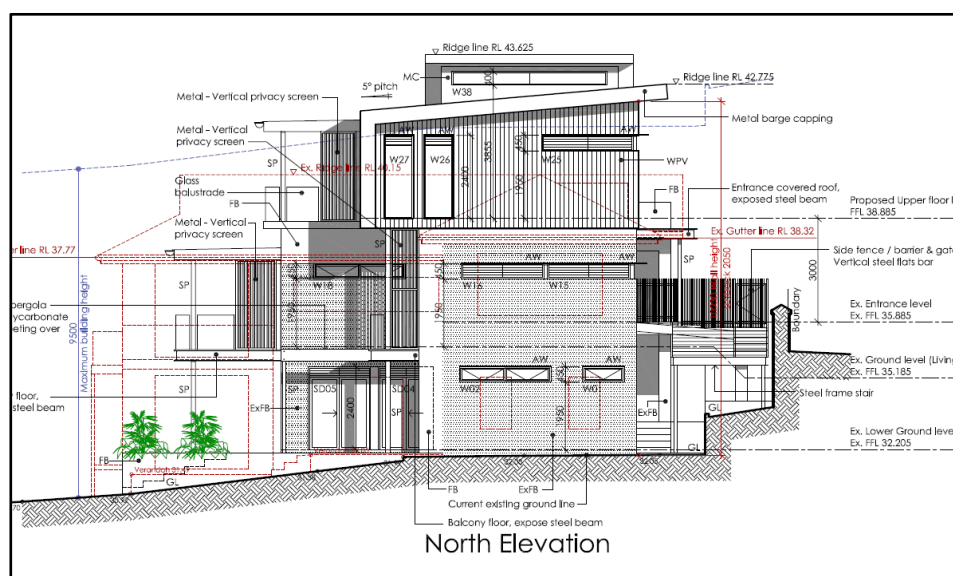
Existing house dashed red on northern elevation (Source: document submitted under DA/637/2019)
